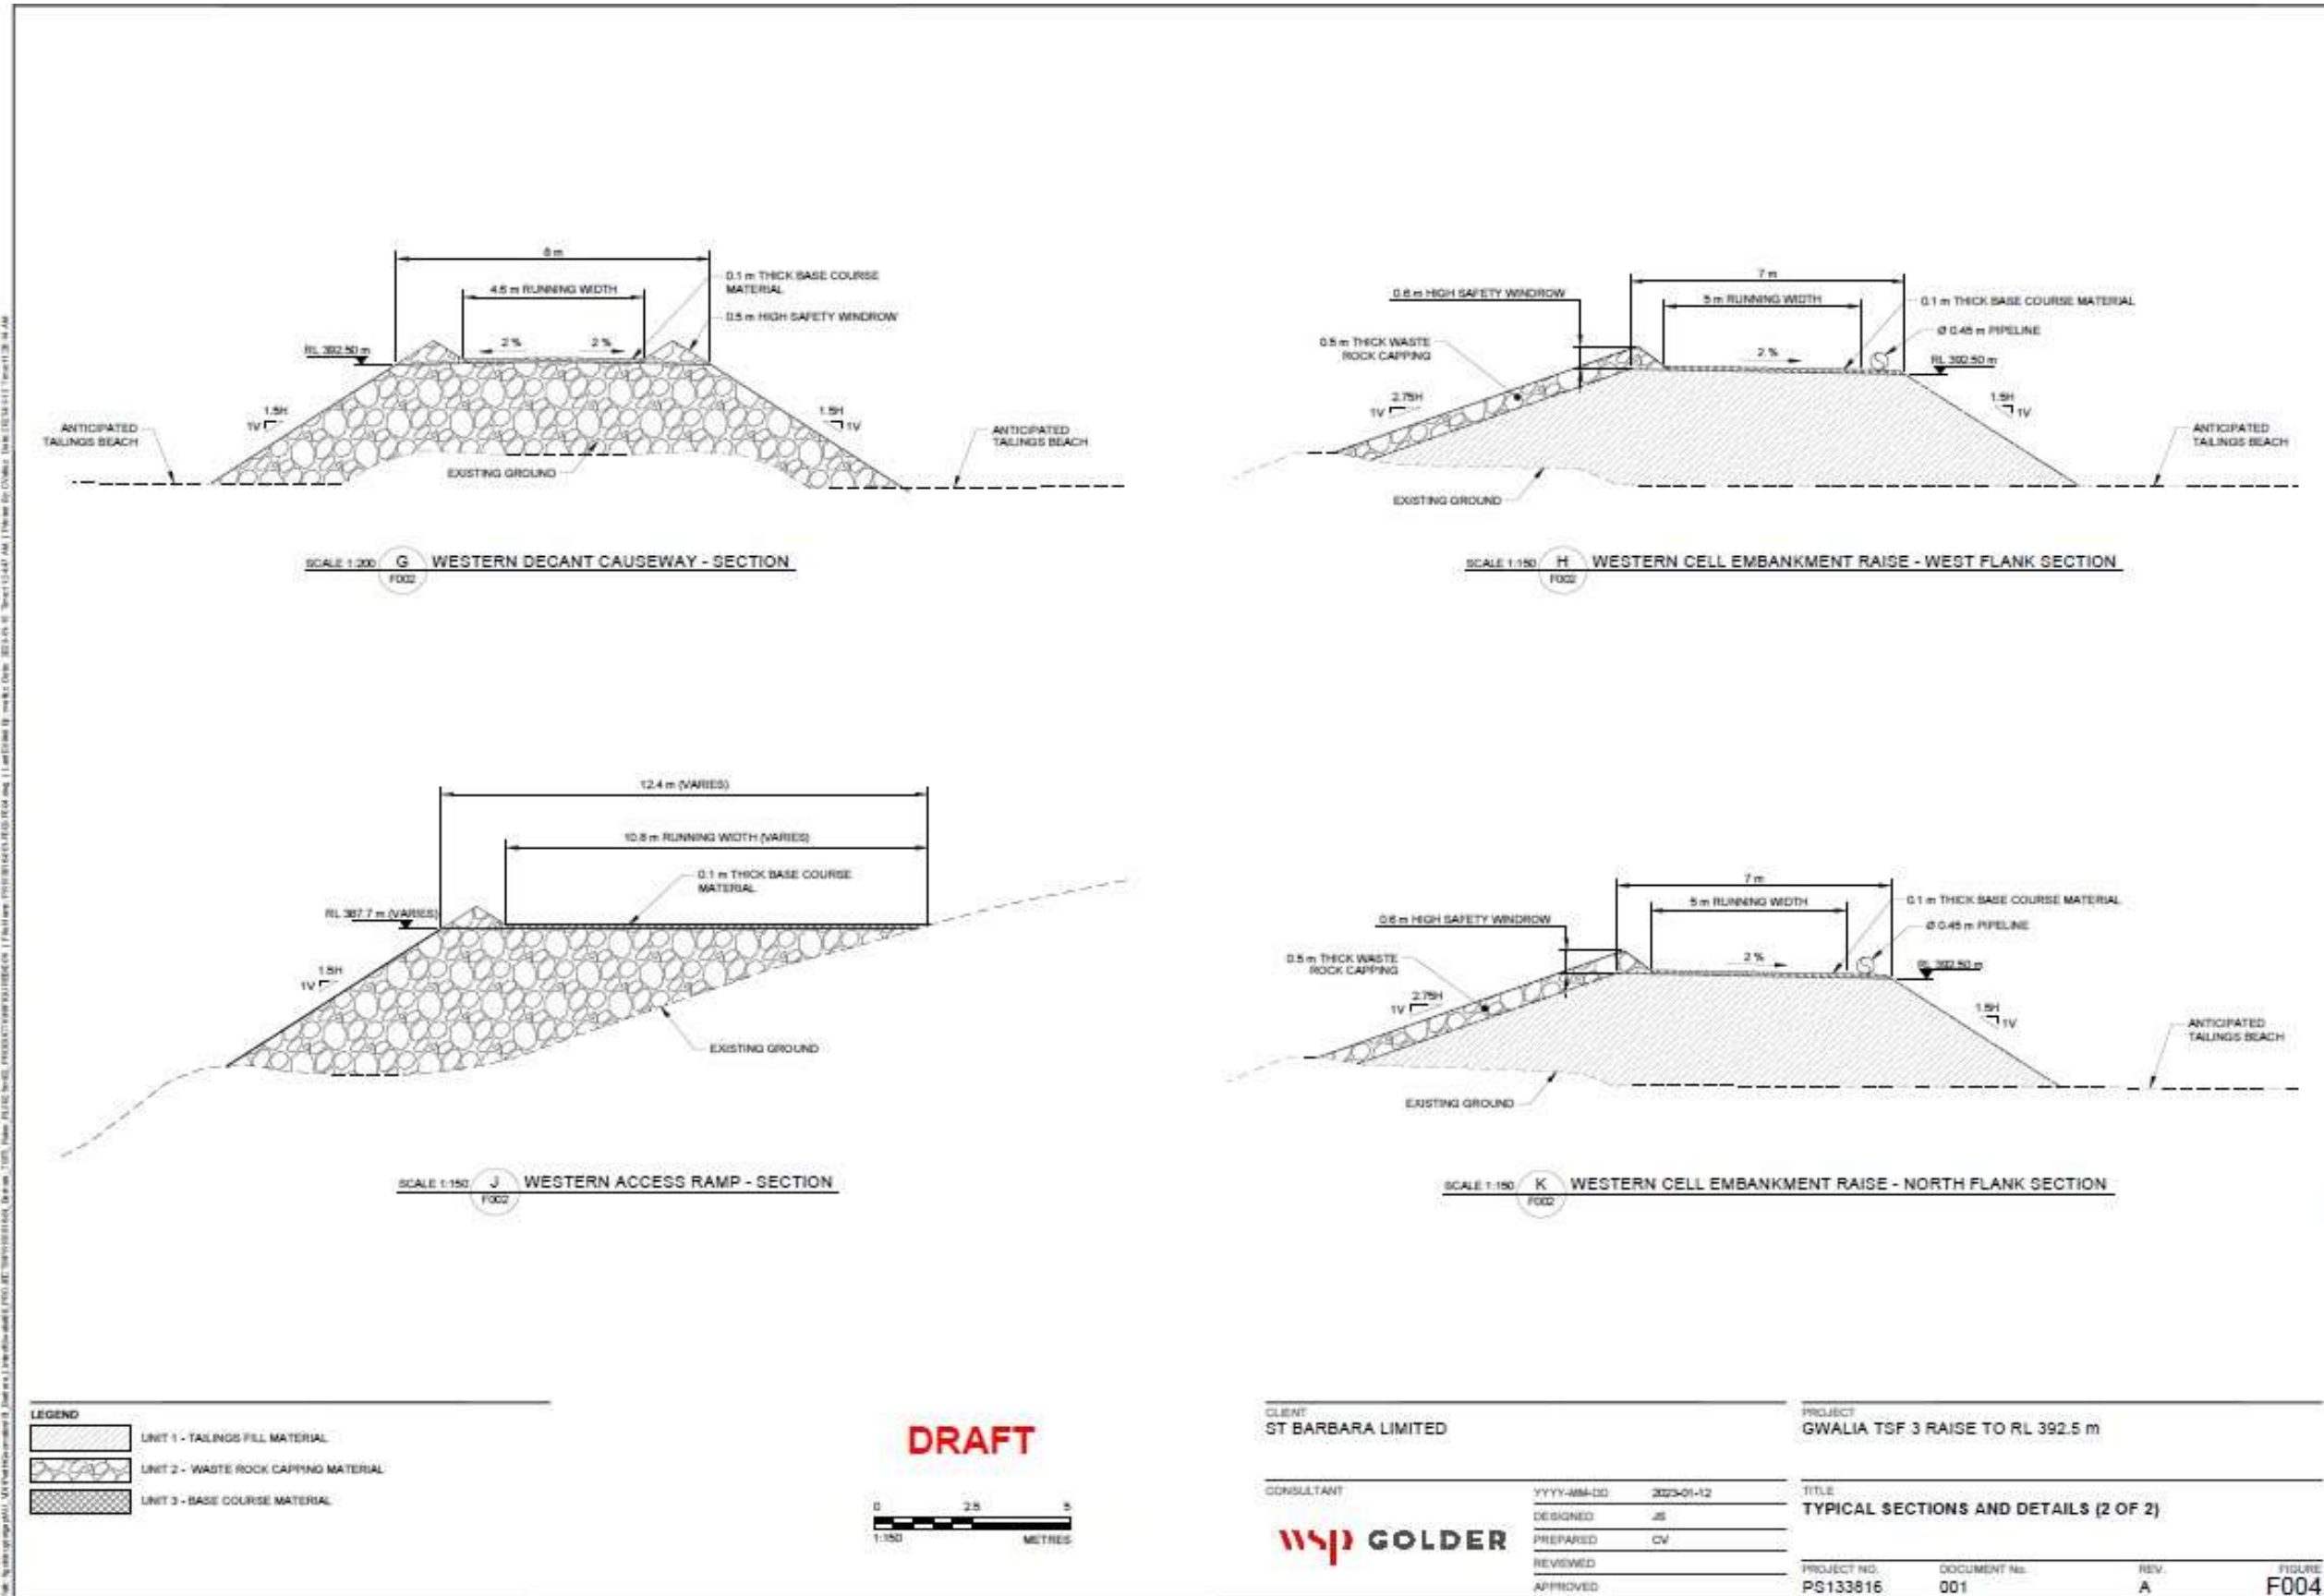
TSF 3 Raise to RL 392.5m – typical sections and details (2 of 2)
